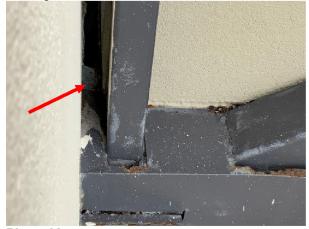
Skybridge-to-Garage Interface – West Elevation – Overall view of missing sealant and exposed framing.
